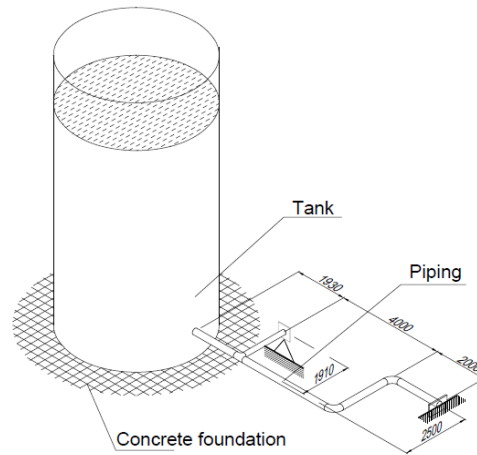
Realistic drawing of the tank-piping system and components, measures in mm.
